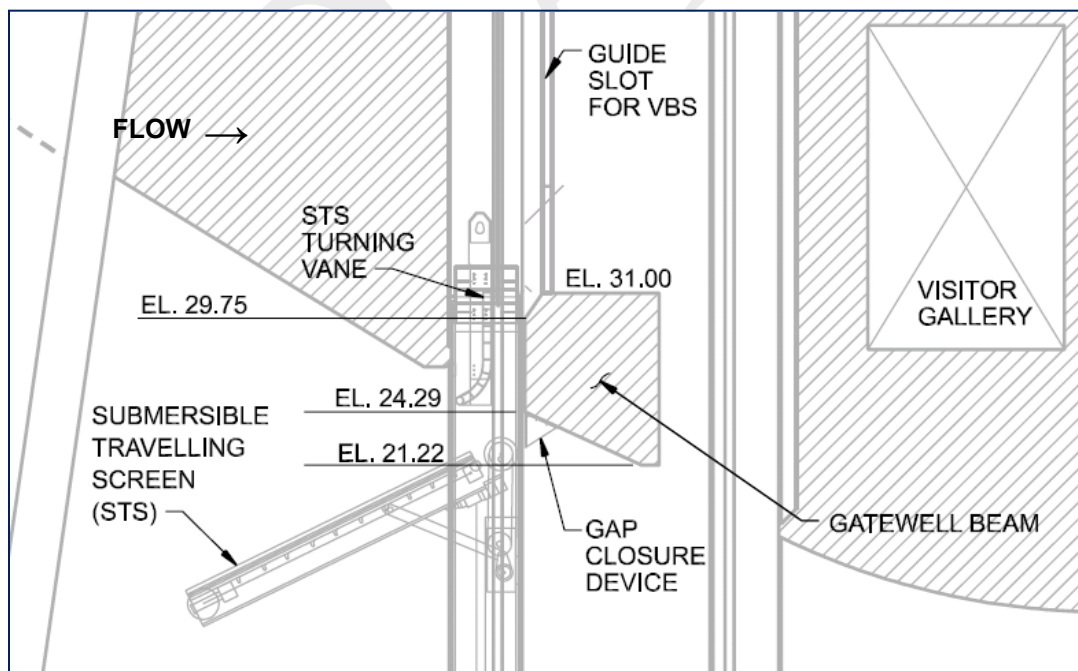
Section through a Bonneville Dam Second Powerhouse turbine intake showing modifications to the gatewell in 2001-2002. Drawing courtesy of U.S. Army Corps of Engineers.
